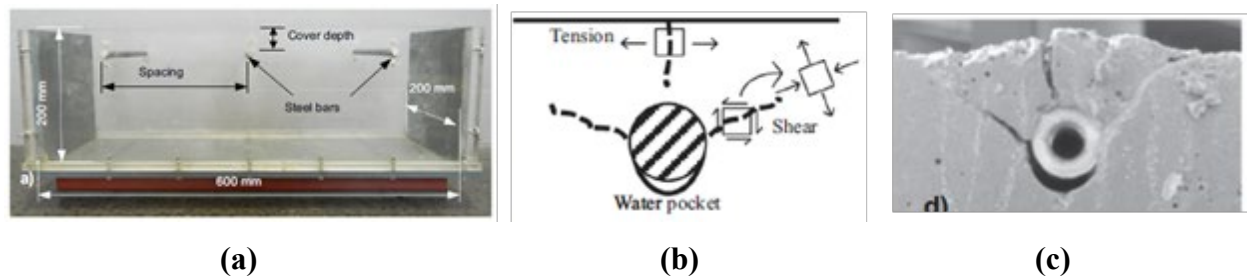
(a) Steel bar mold. (b) and (c) Tensile crack, shear crack, and water pocket formation below the reinforcing bar. (Combrinck and Boshoff 2013)
